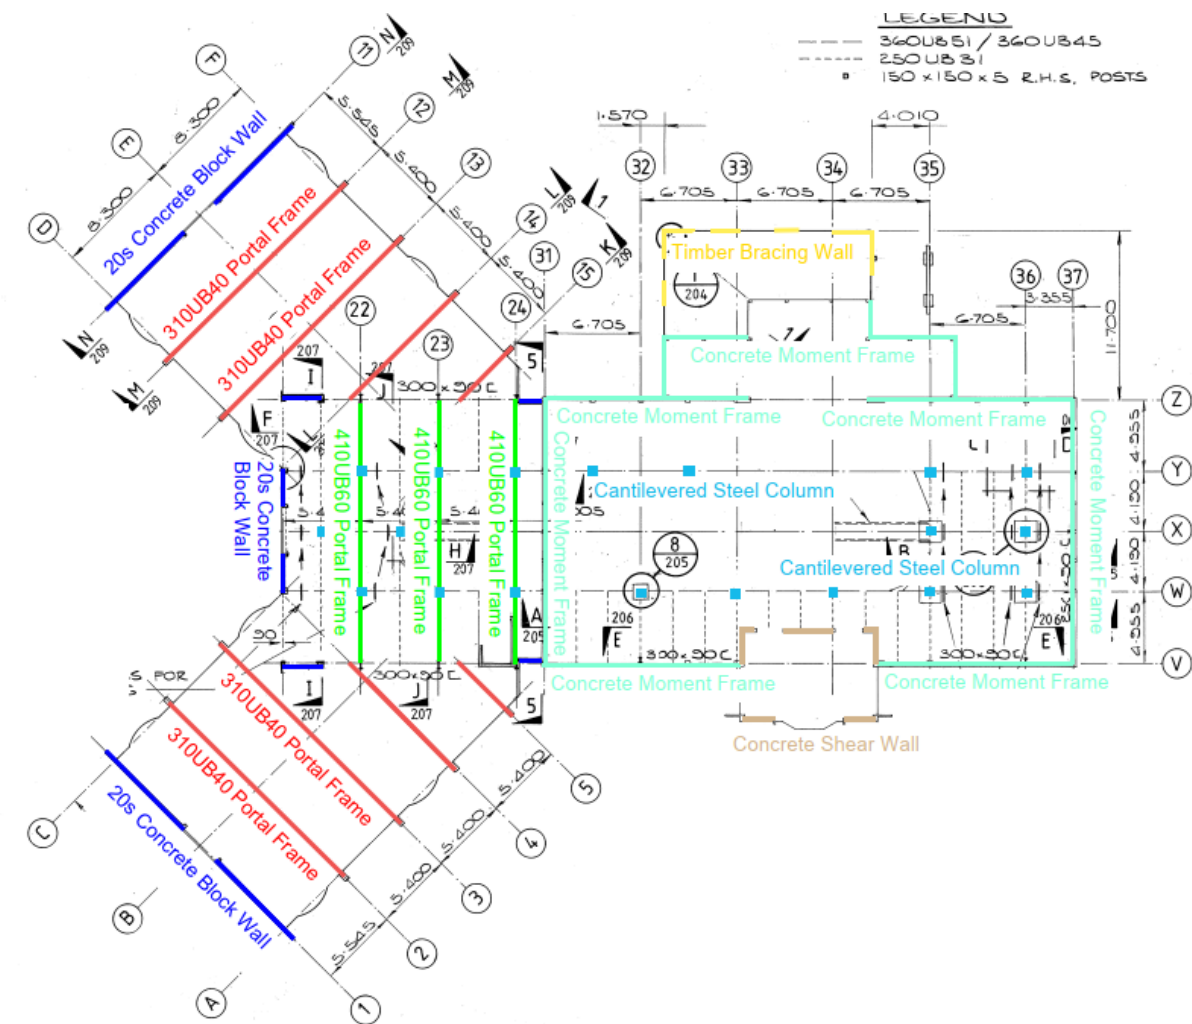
Plan View Showing Types of Lateral Bracing Element in the Longitudinal and Transverse Direction (Schematic Layout Produced for Assessment Only)
